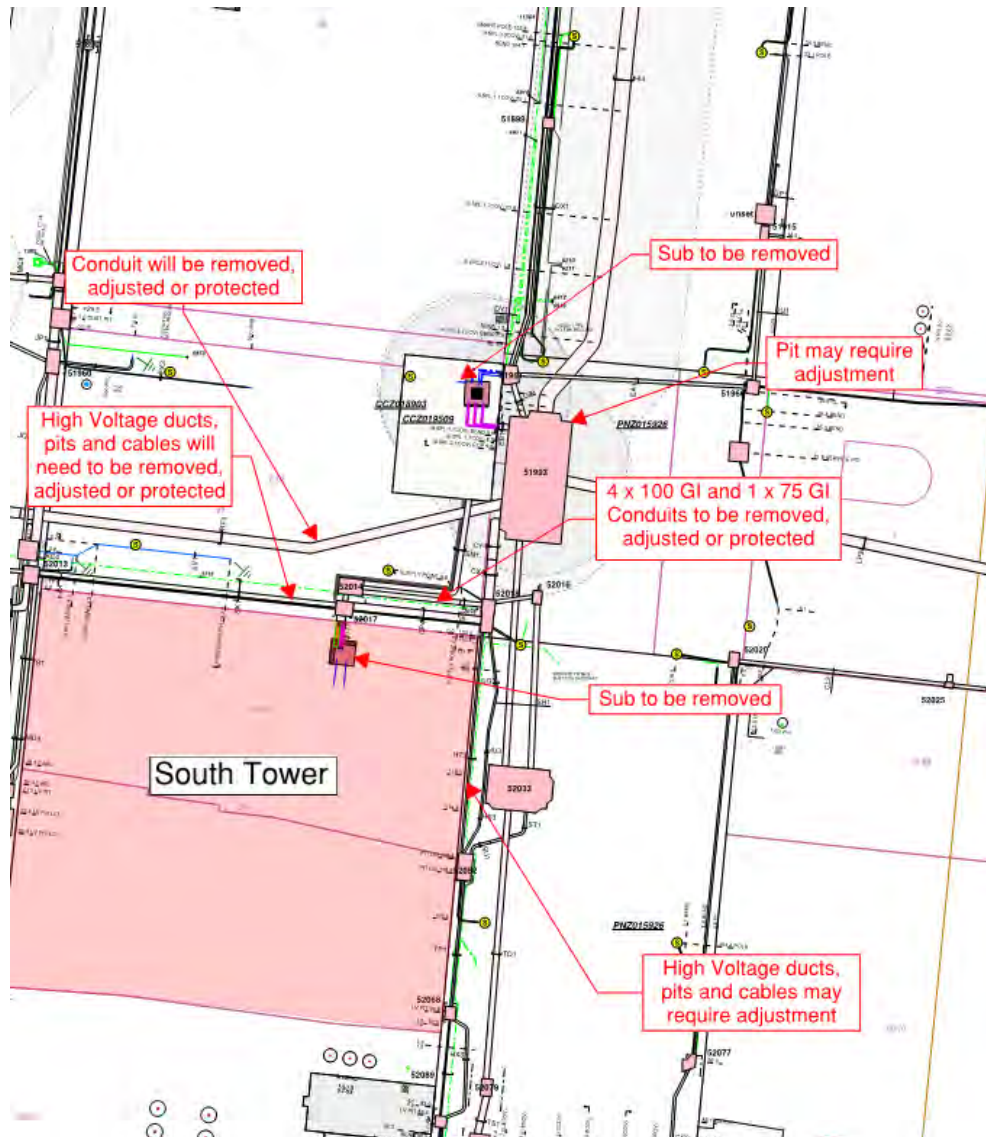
Electrical existing infrastructure & proposed alterations/ diversions (South Tower)
